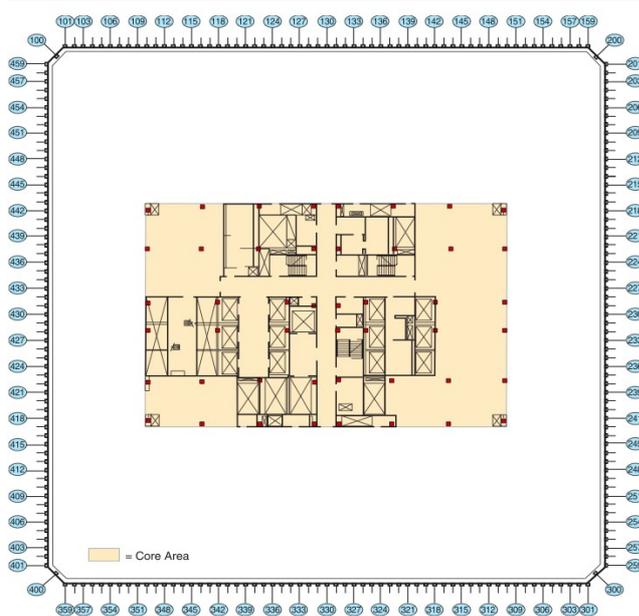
Representative floor plan (based on floor plan for 94th and 95th floors of WTC 1).
